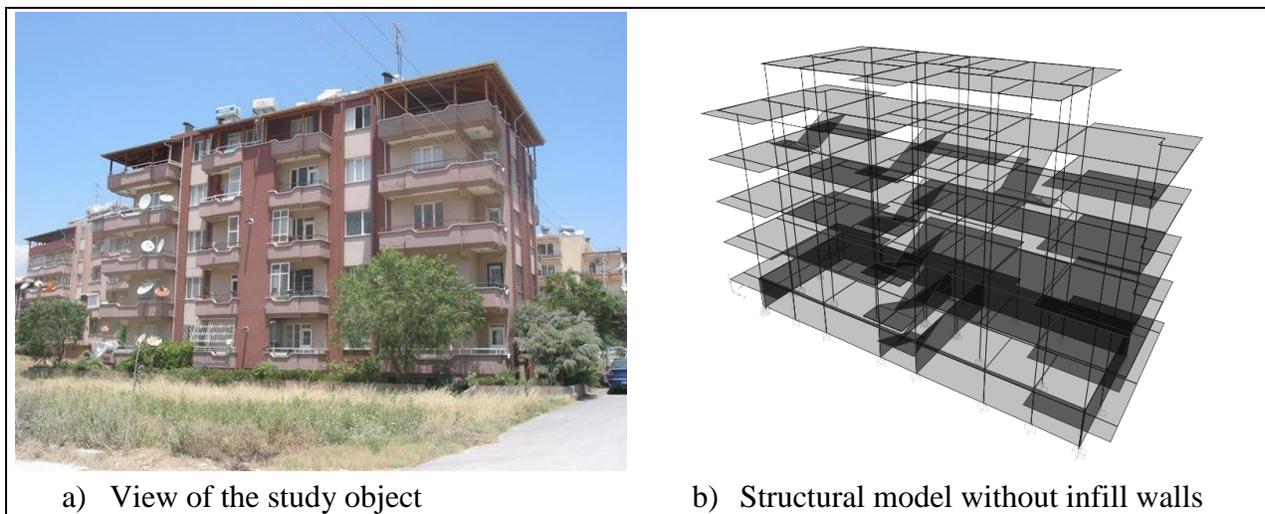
View and structural model of the example 5-story residential reinforced concrete building.
